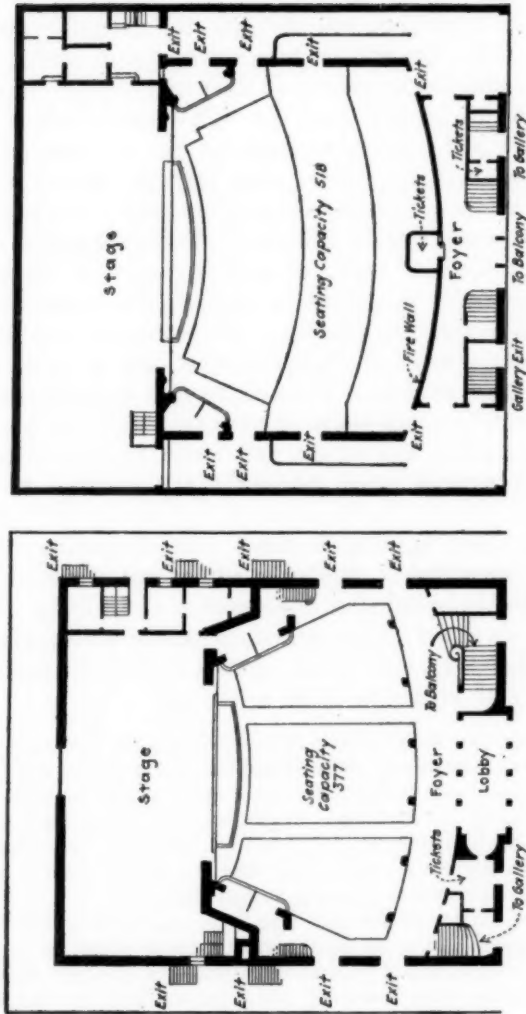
TYPICAL AND PROPOSED THEATER PLAN SHOWING USE OF FIRE WALLS, SIDE ENTRANCES AND EXITS
